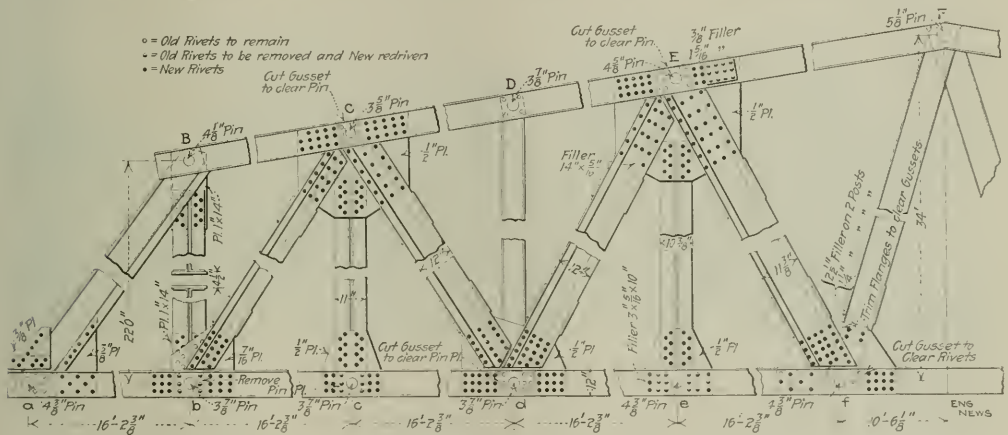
DETAILS OF TRUSS AS CONVERTED FROM PIN-CONNECTED TO RIVETED TRUSS
